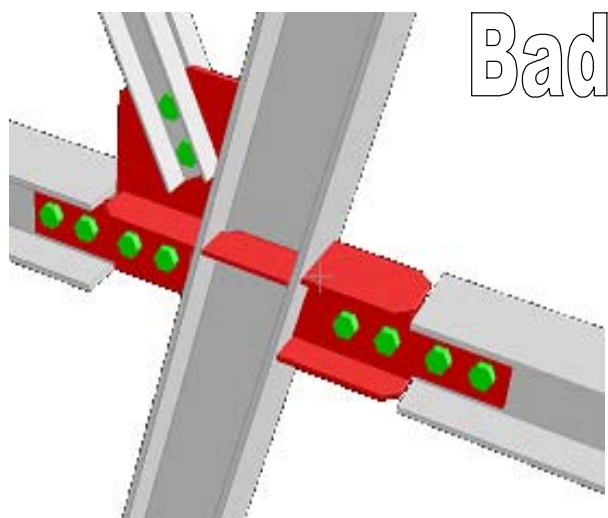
Simple beam to column joint of open hot rolled sections with diagonal bracing, unsuccessful case because of difficult to fabricate and erect, expensive solution; column HE180B; beam HE180B; bolts 4xM20
